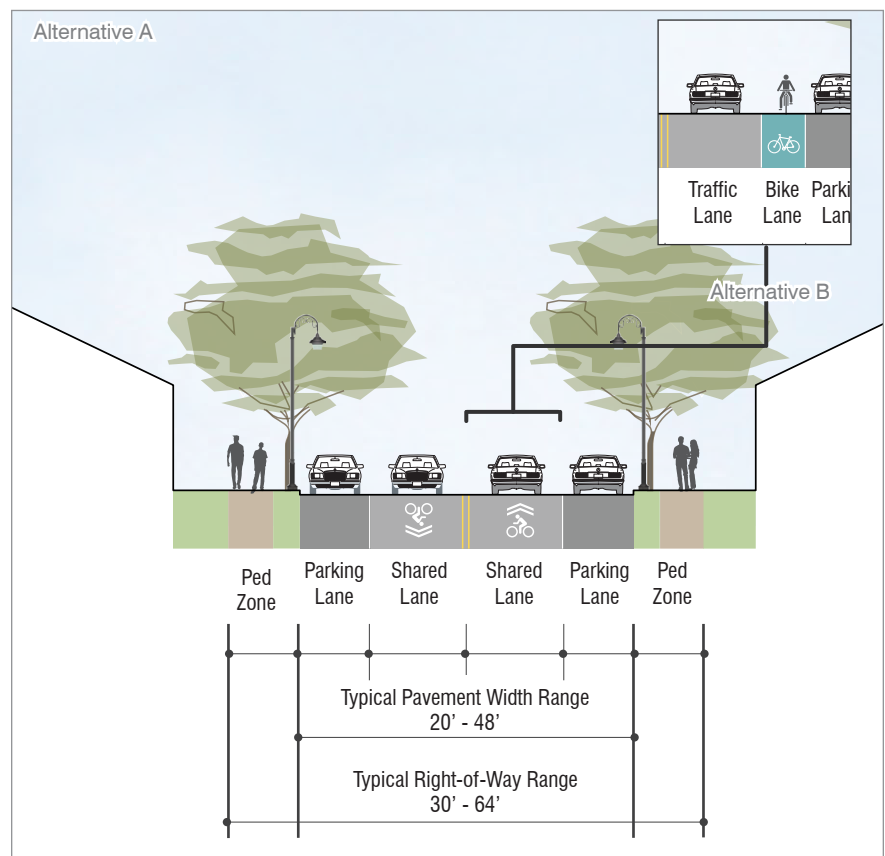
Typical Existing Street Section for 'Residential Street' Typology
